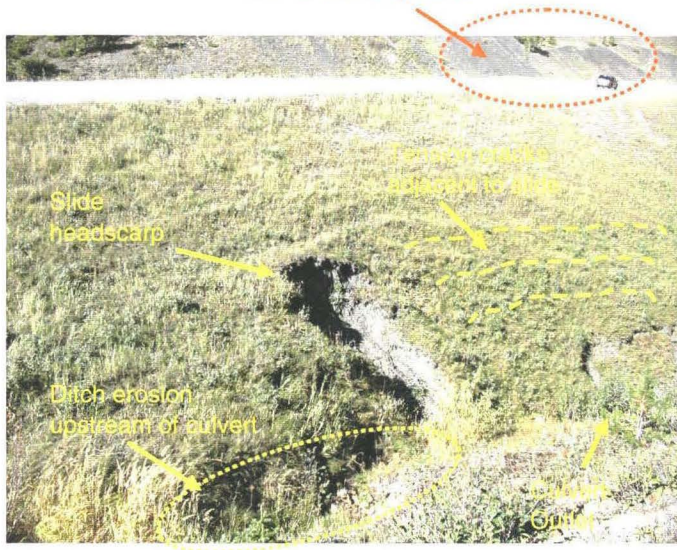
(top) – Facing northwest toward the slide area on the embankment slope. The slide appears to have been triggered by ditch erosion along the toe of the embankment slope. Tension cracks were visible in the embankment slope adjacent to the active slide, and that area may further destabilize in the future.
